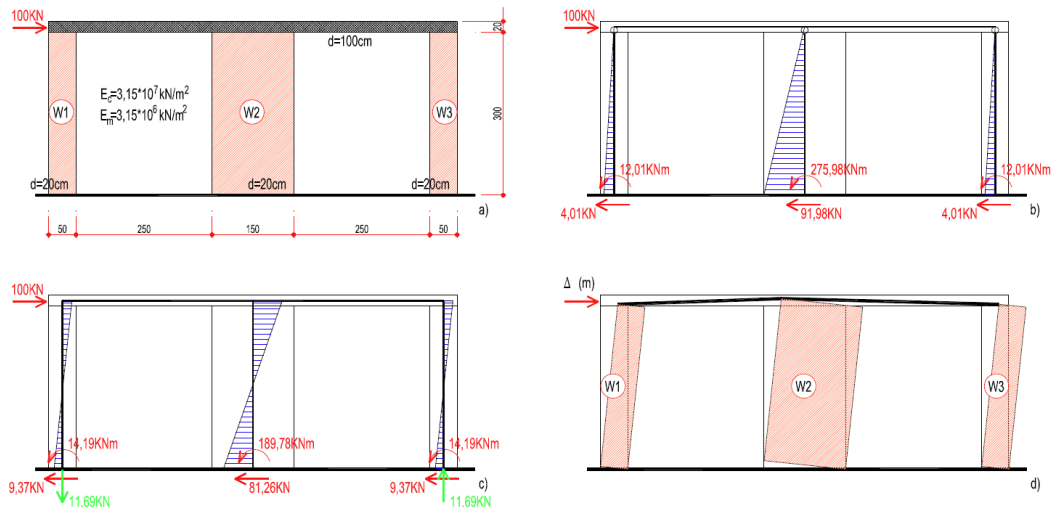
Structural models: a) 2D view, b) system of cantilever walls, c) frame structure, d) assumed behavior.
